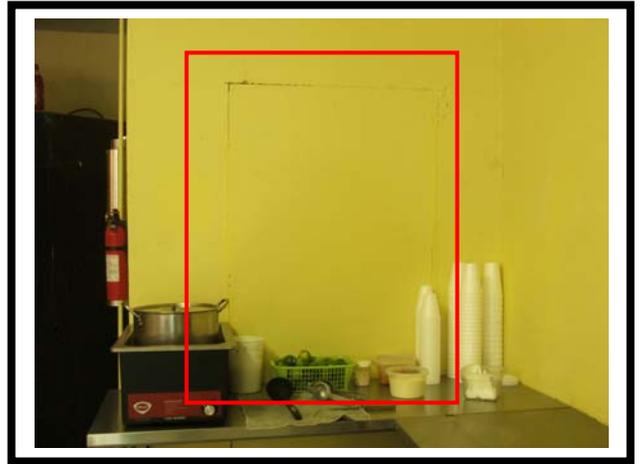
Doorway behind kitchen shelving and other kitchen equipment not accessed. May be a mechanical room or ????
